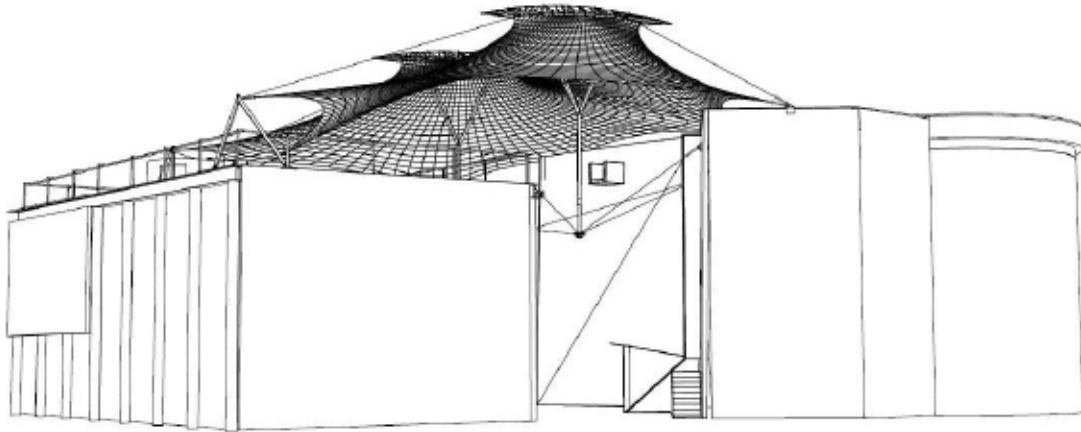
Elevation showing the layout of the roof and the system of lanterns with floating poles.
